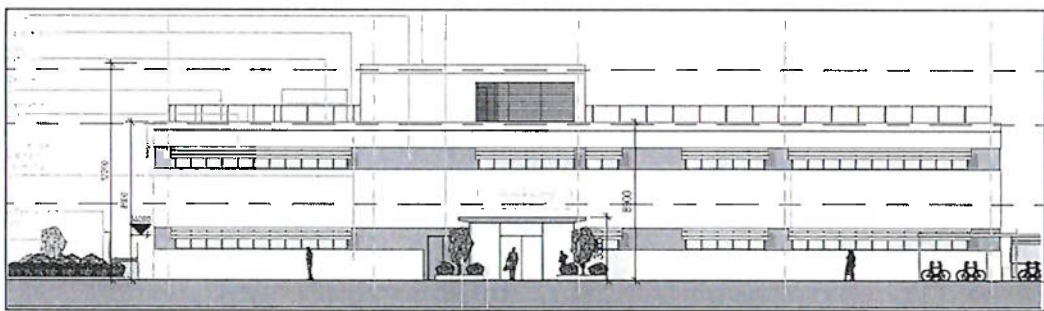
Proposed SASC eastern elevation (Pascall + Watson, 2023).
